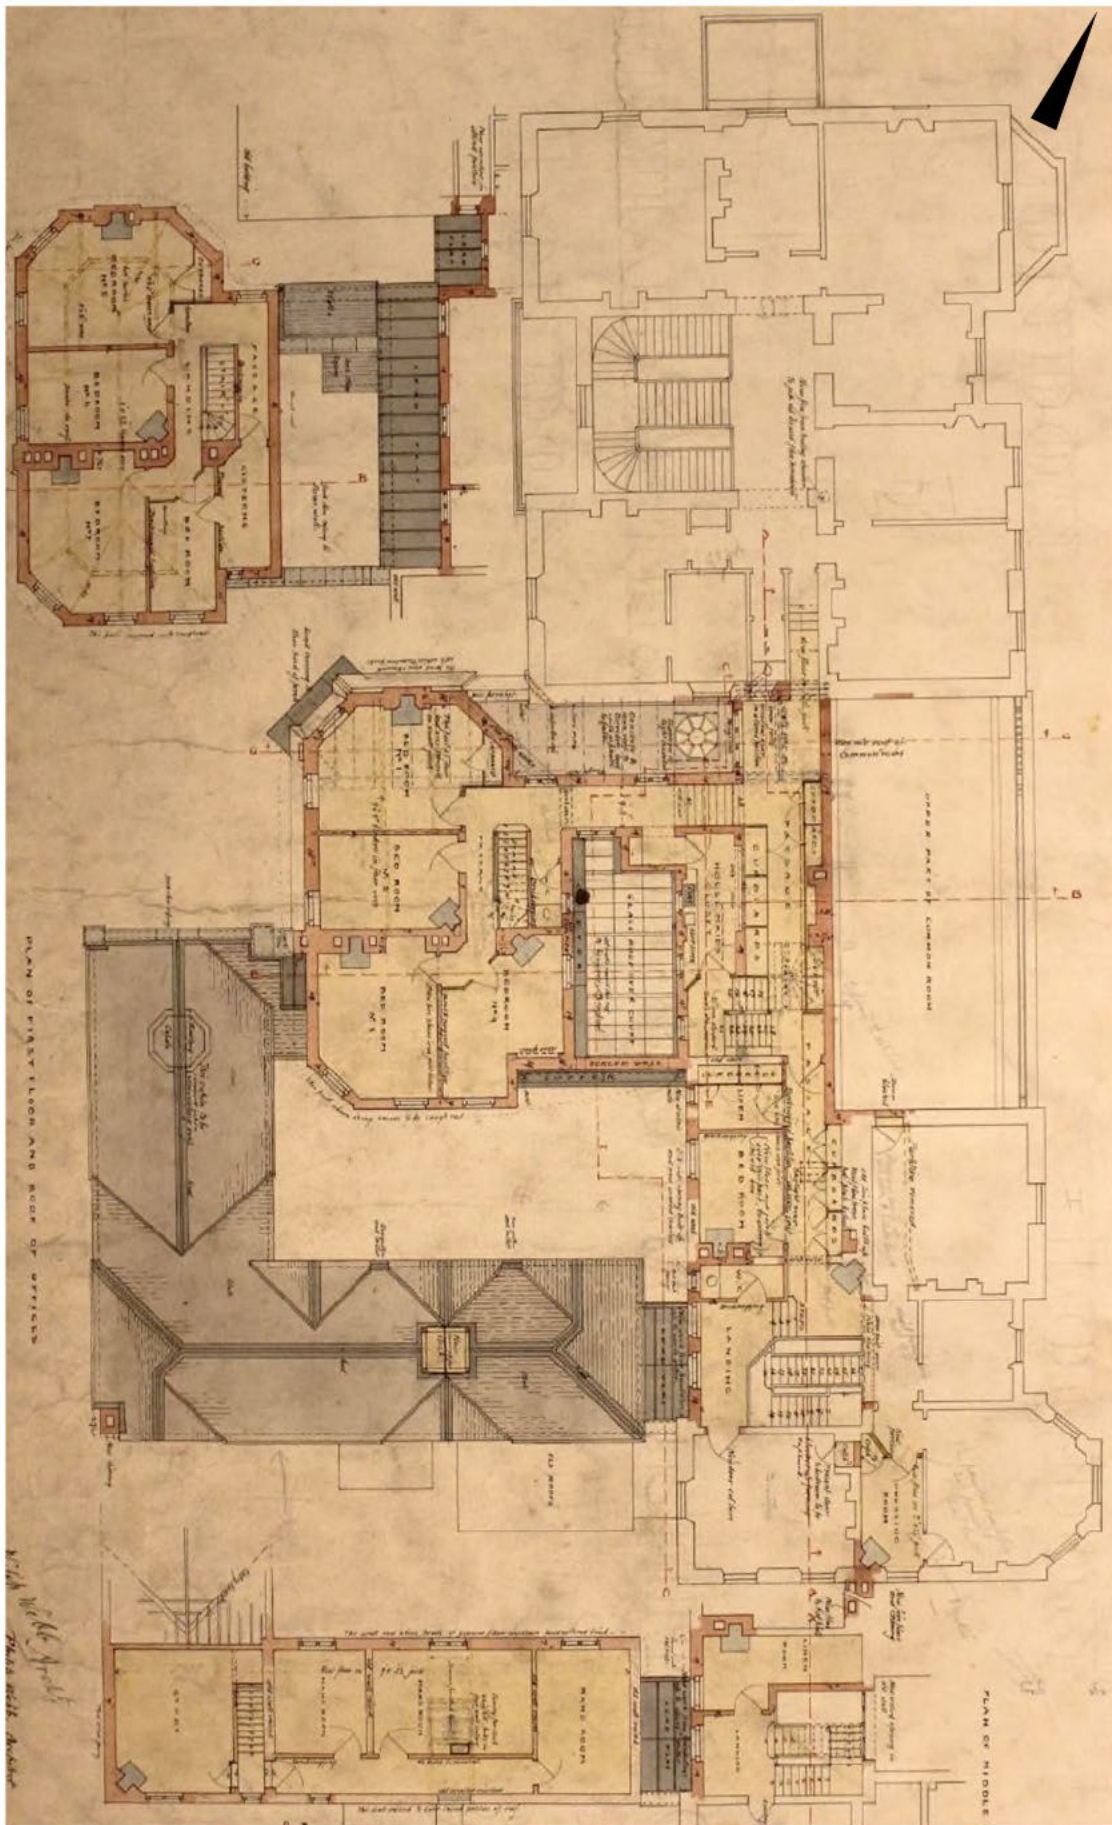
Philip Webb's first floor plan, 1898. © SPAB Archive.
